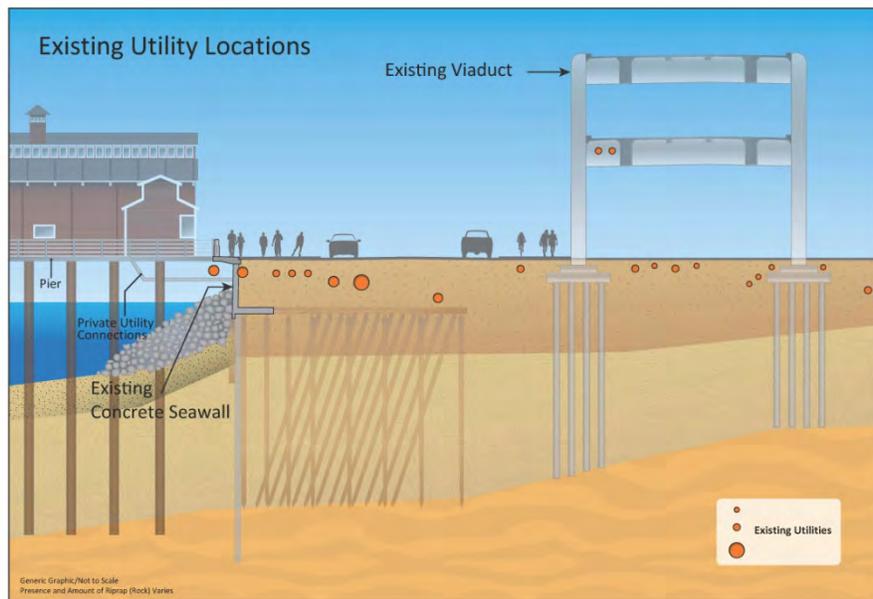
Representative Cross-Section Showing Typical Existing Utility Locations within Project Limits
